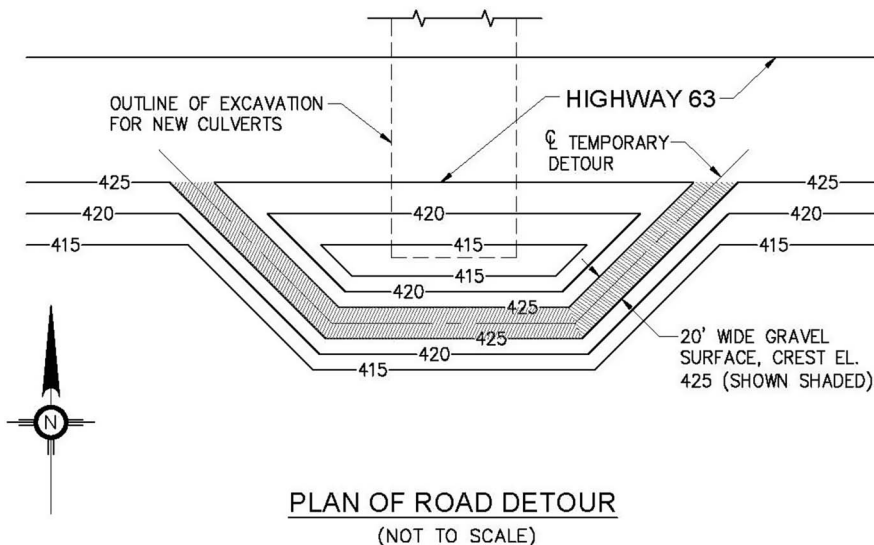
P-3. Plan of Road Detour Showing Topographic Contours
